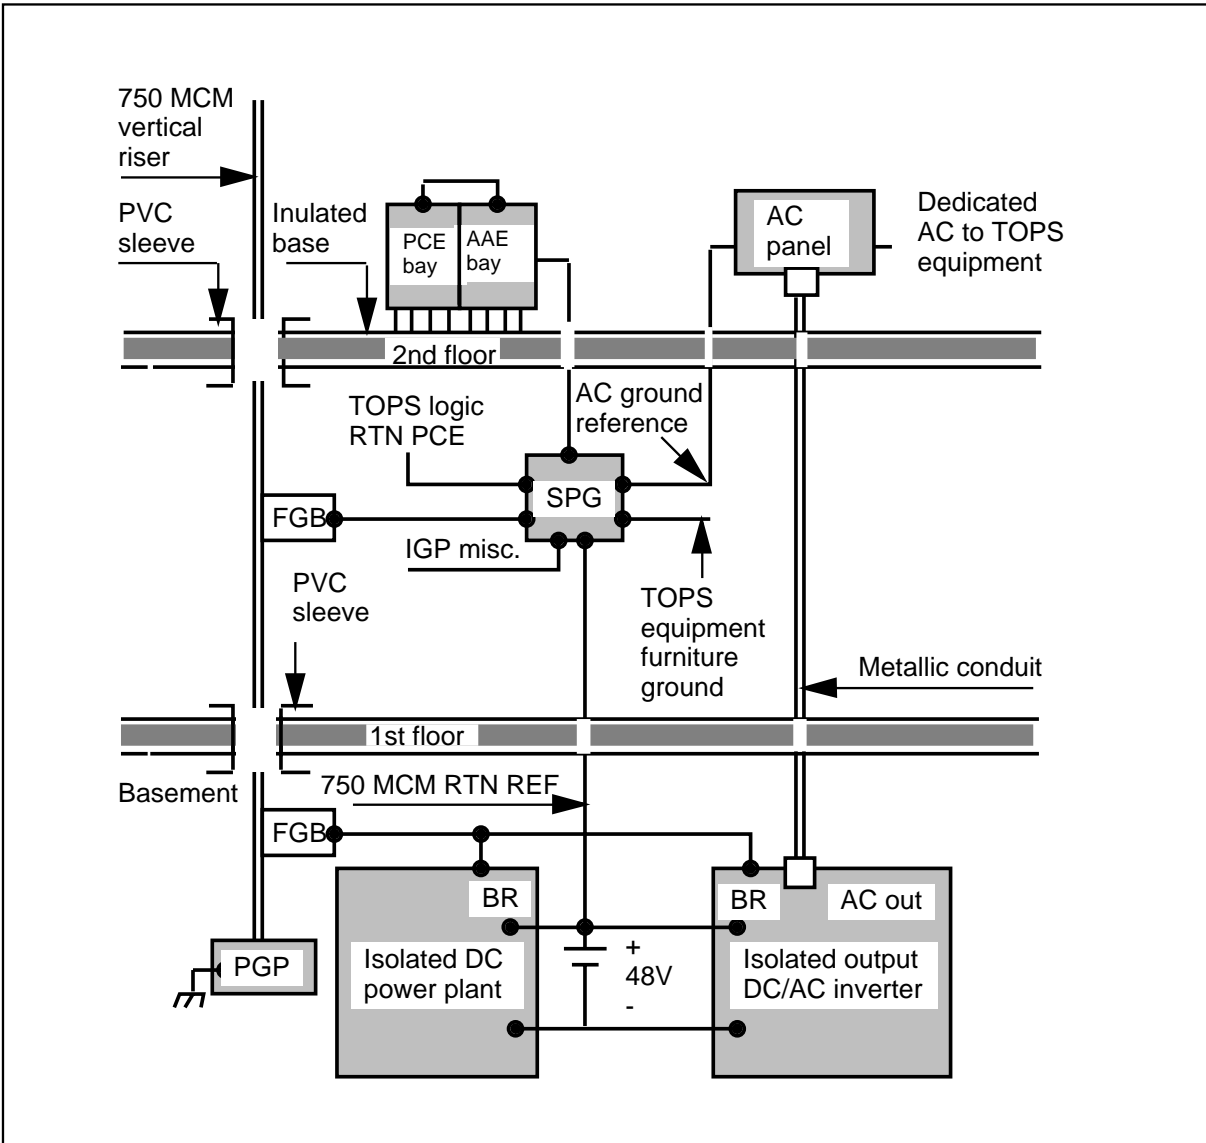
Typical TOPS MP System Grounding Arrangement
